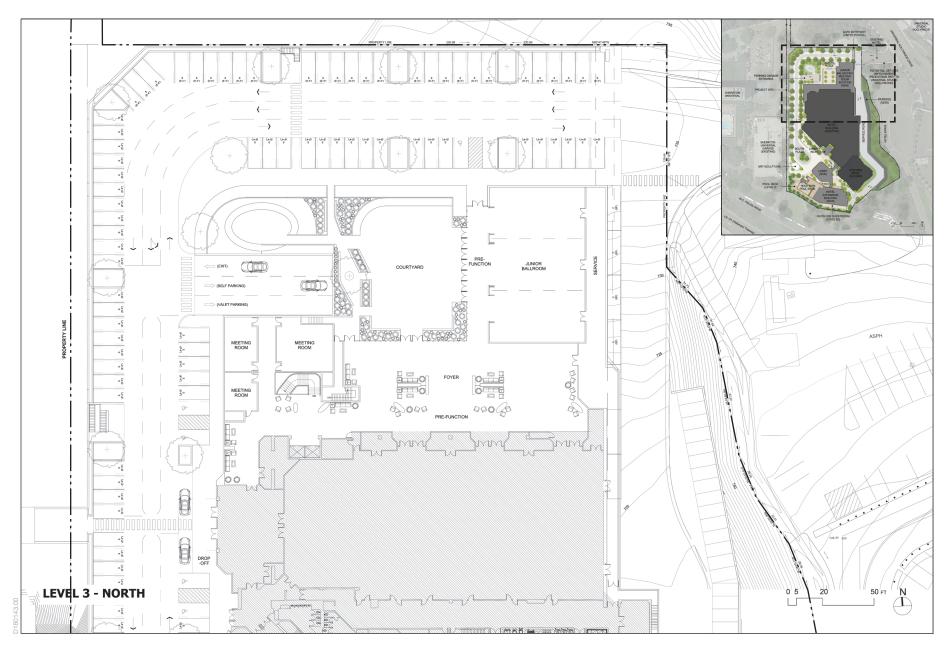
Level 3 (North) – Junior Ballroom/Meeting Room Addition
